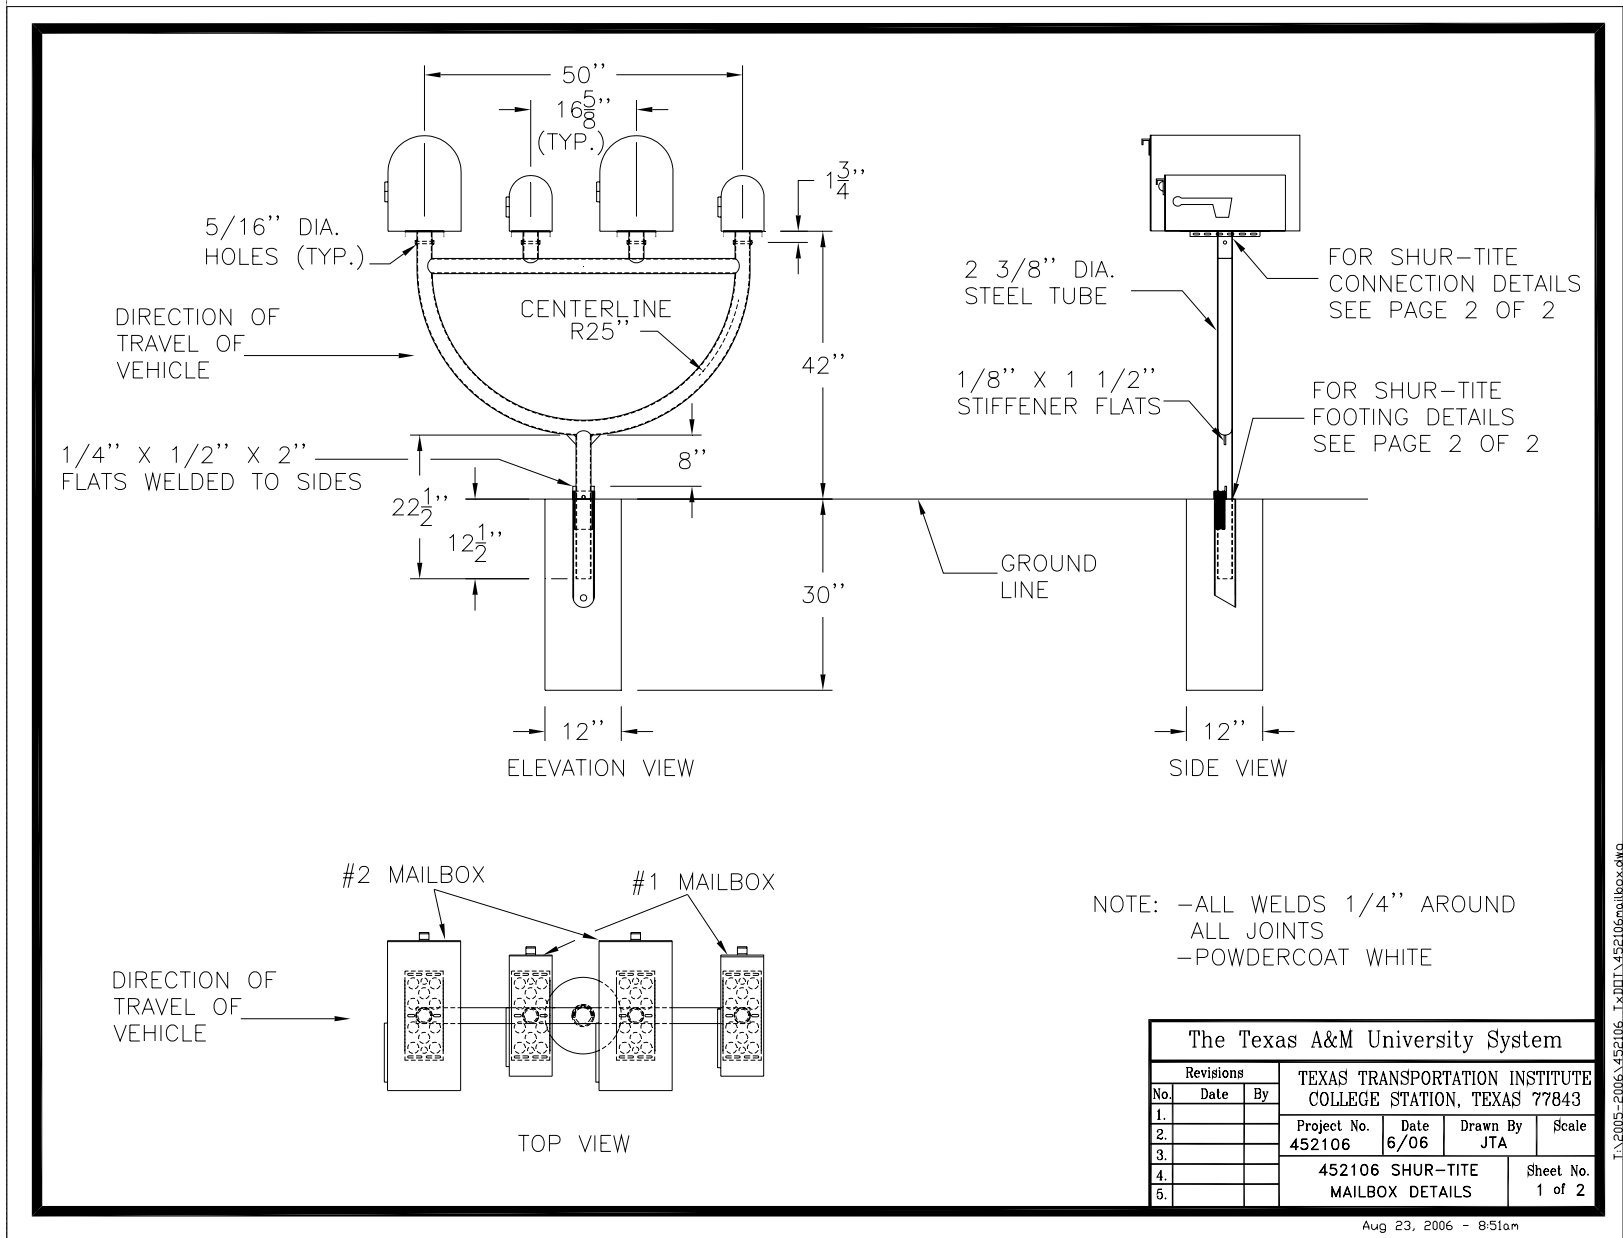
Details of the Shur-Tite® Multiple-Mailbox Mount Installation.
